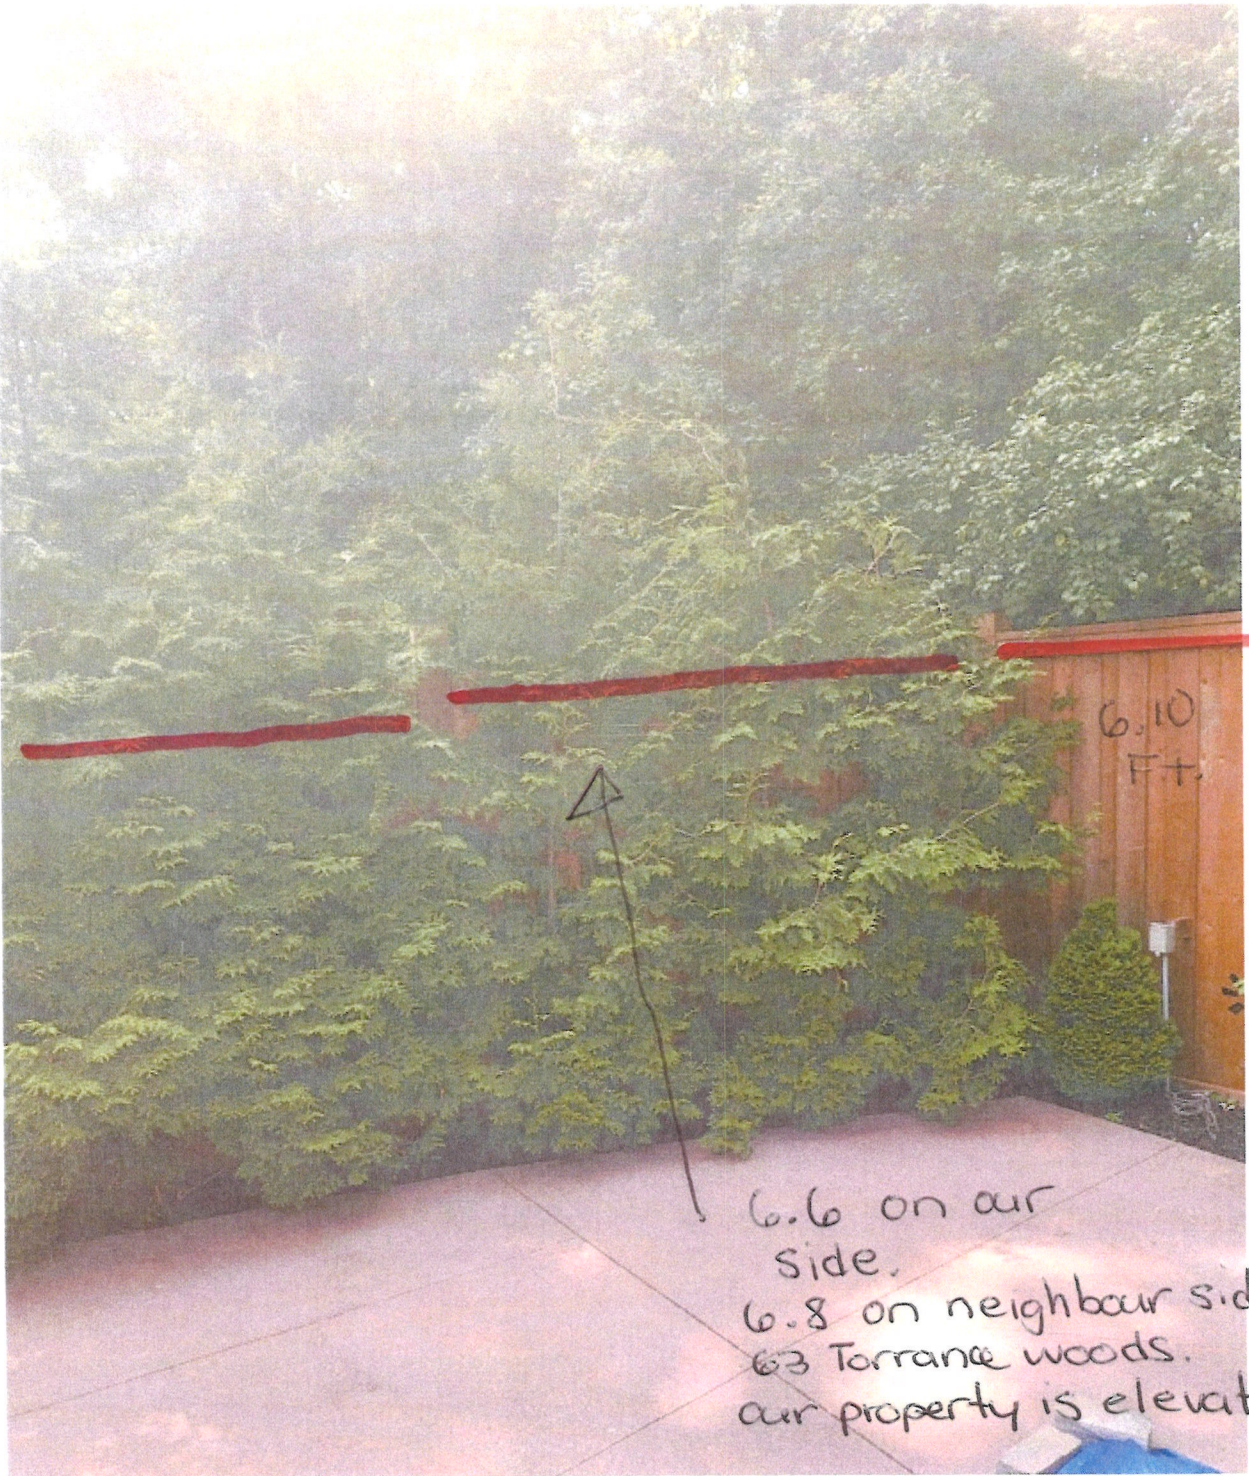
Photo view from neighbour's property 63 Torrance woods facing our property 65 Torrance woods.
